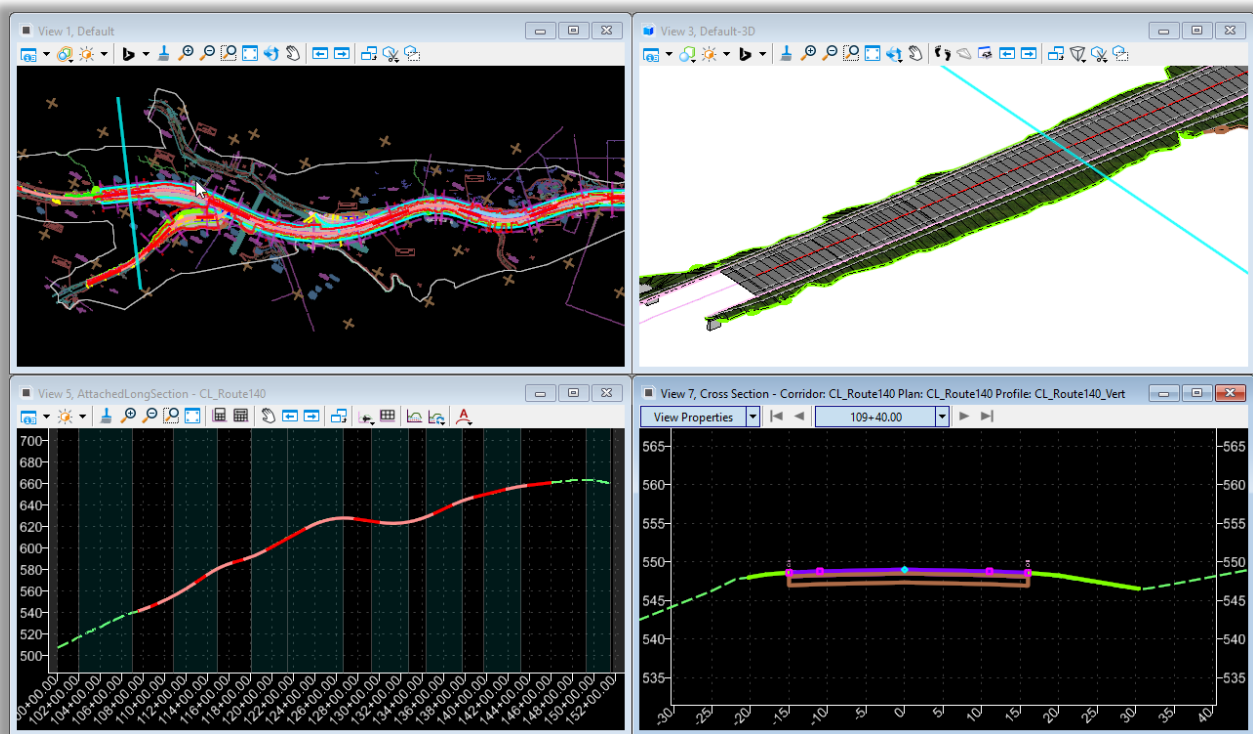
4 Views Plan/Profile/XS/3D item.
